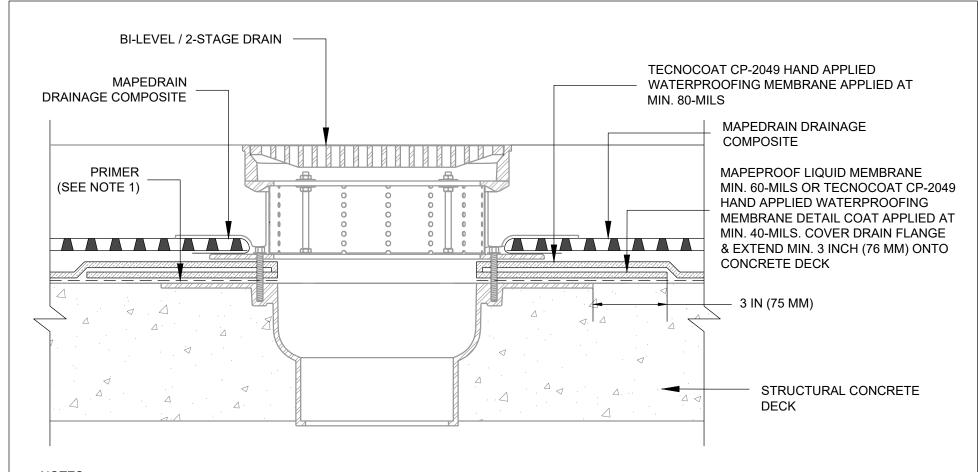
DETAILS ARE INTENDED TO BE A GUIDE FOR WATERPROOFING INSTALLATION ONLY
